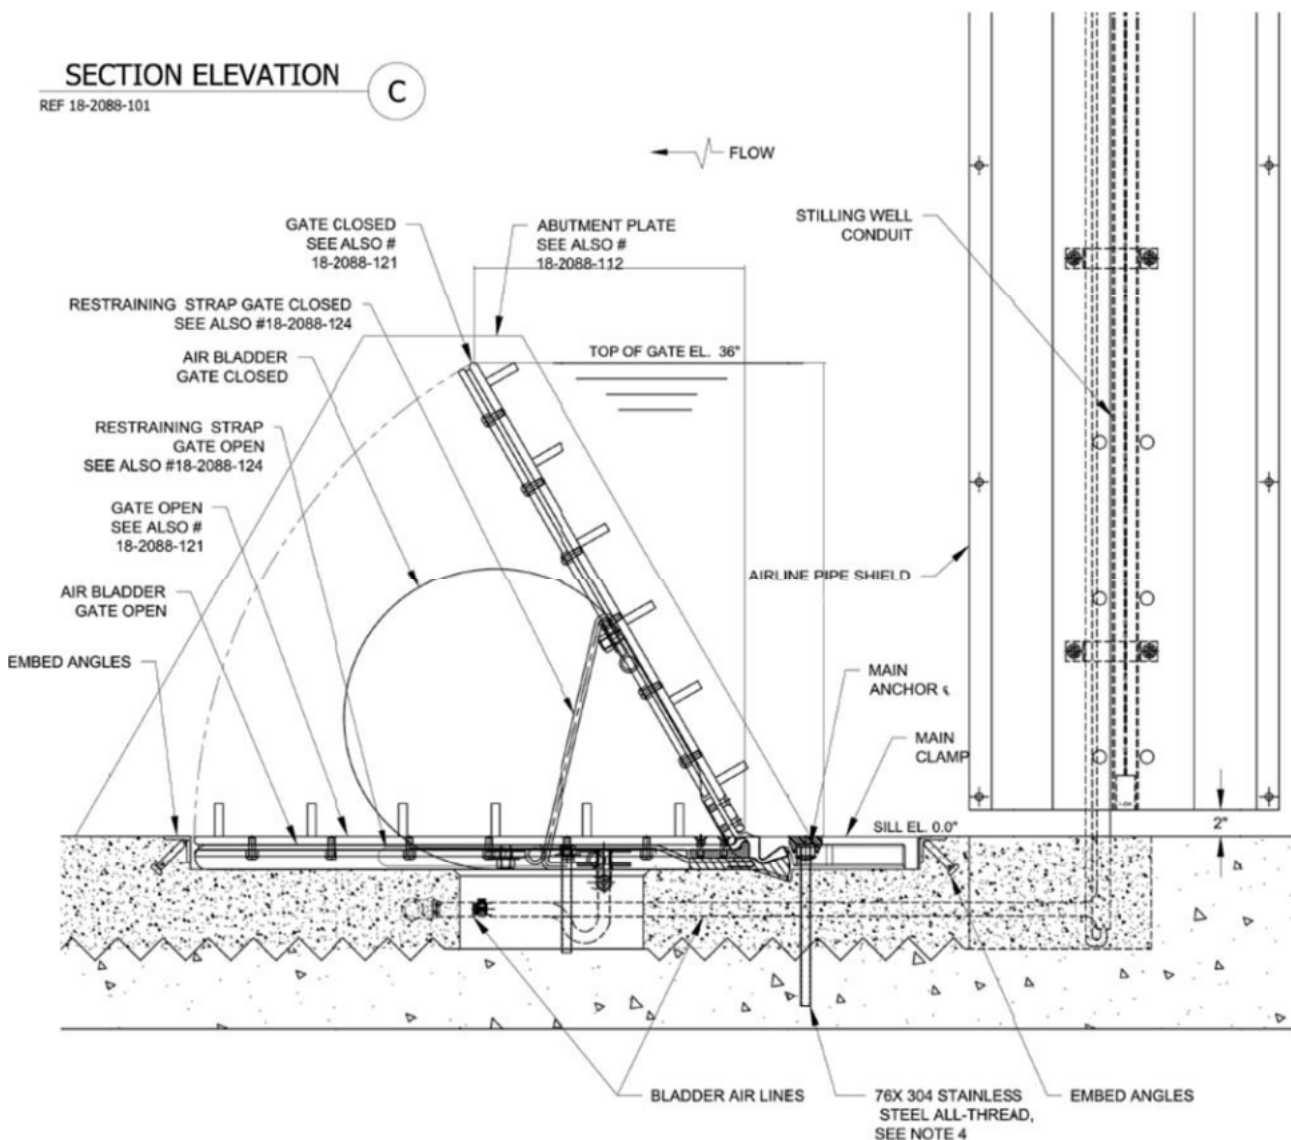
Obermeyer air-inflatable rubber dam section elevation
